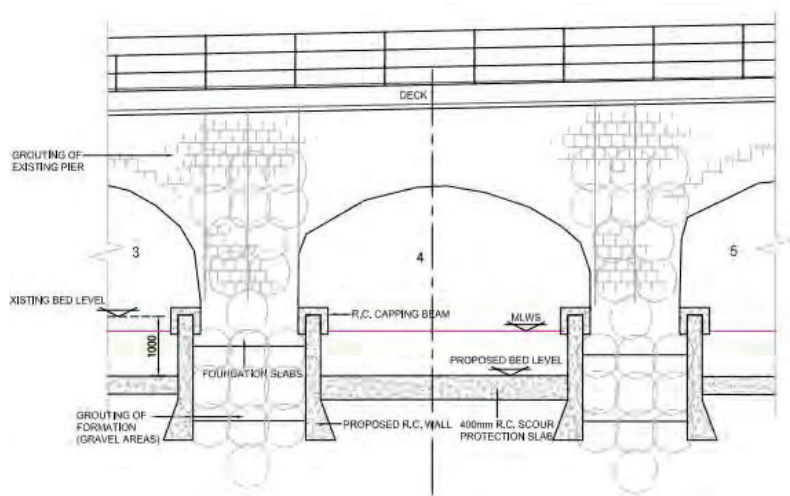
Underpinning by foundation improvement with RC wall around each pier option (extracted from Drawing No. 1010).
